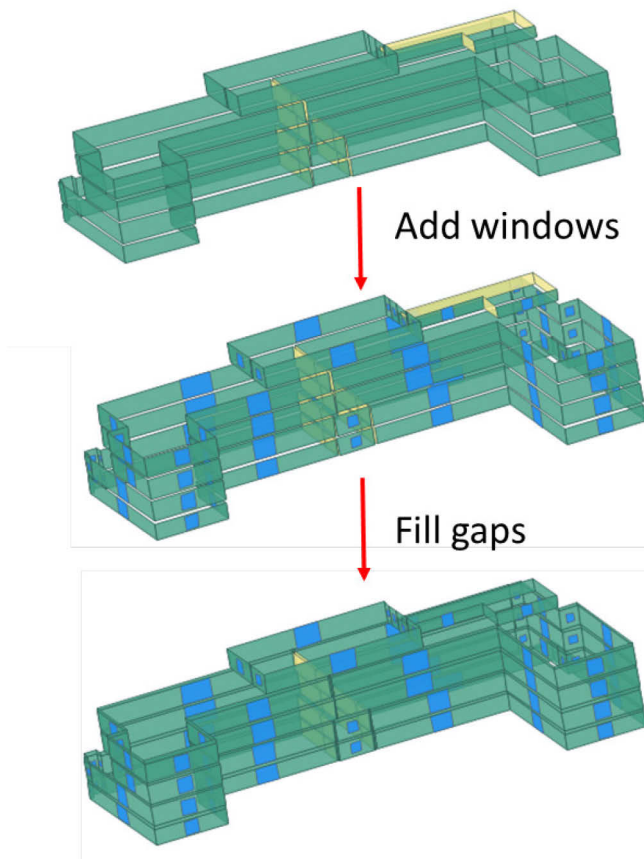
Adding windows and filling wall gaps for the main building model in RIUSKA.
